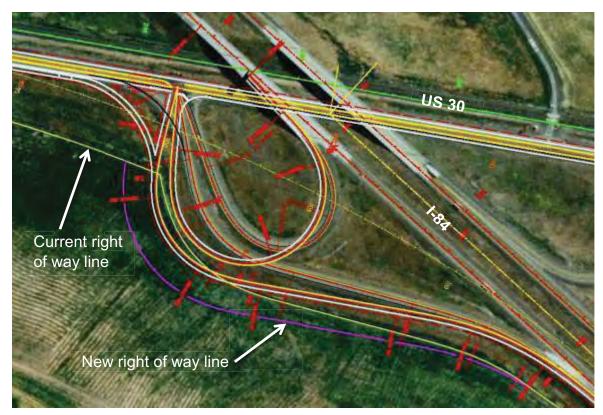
Potential footprint of improved I-84 Eastbound loop ramp
